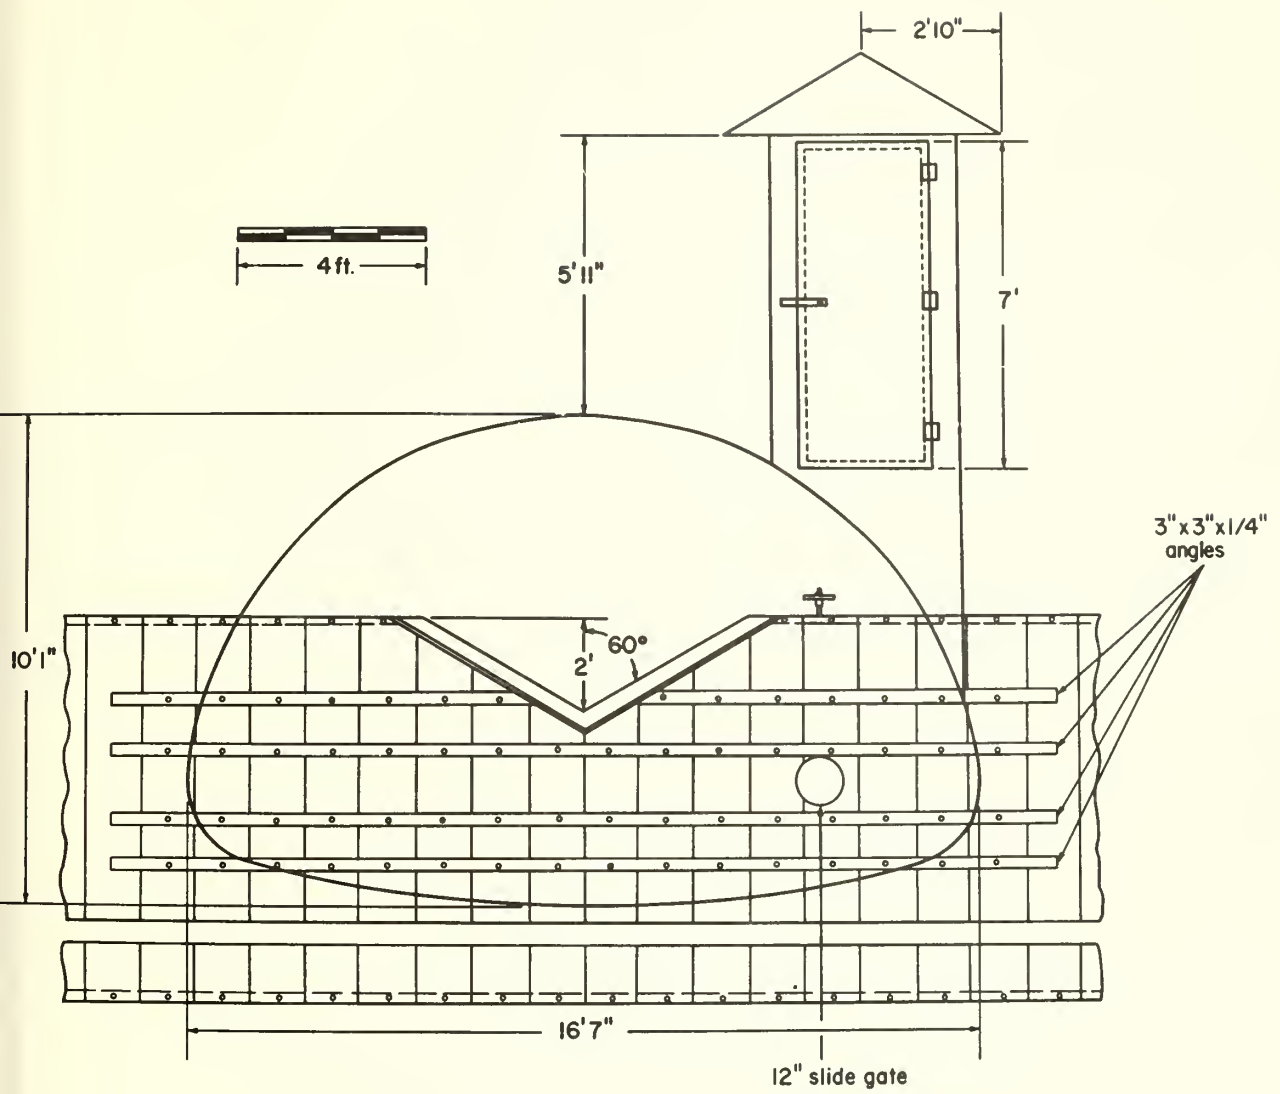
Section B-B: view at cutoff wall of the enclosed weir.
